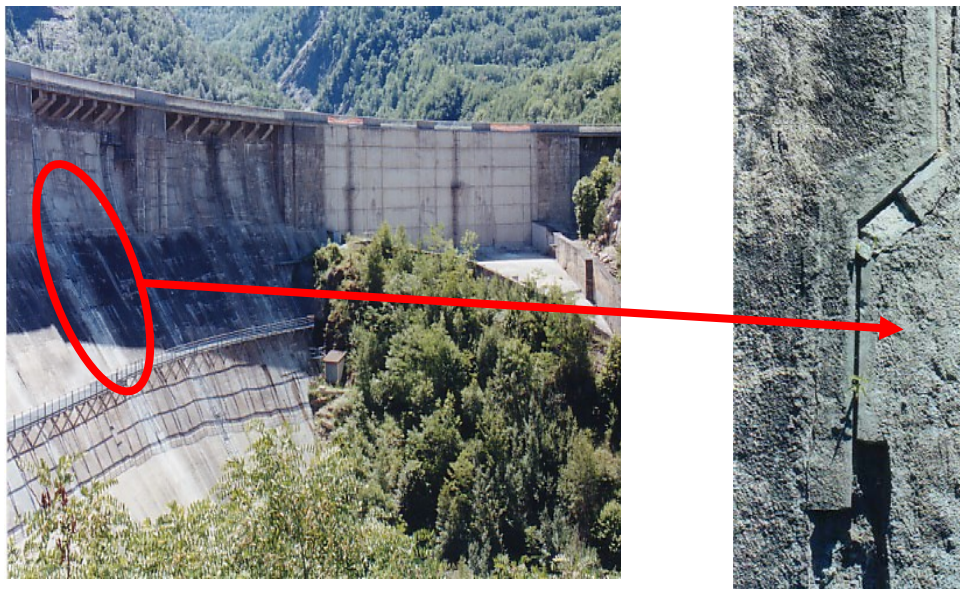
Gravity dam suffering from Alkali-Silica Reaction with spalling of the concrete near the vertical joints (particularly on the right)
